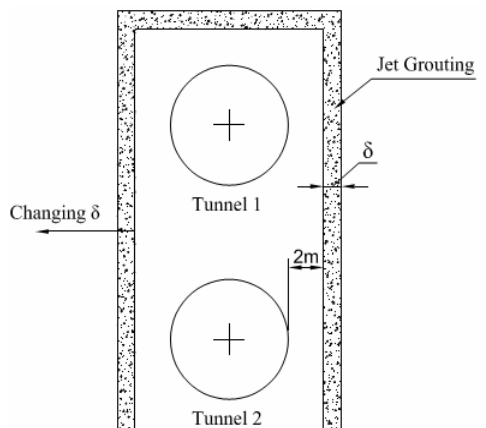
Alternative using mortar of Jet Grouting at Km0 + 900 on the Metro
